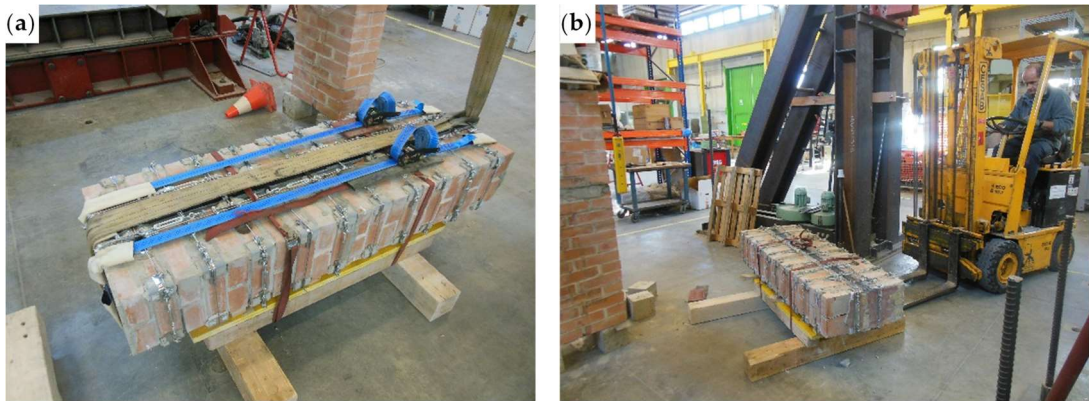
Handling of Specimen W5: (a) overturning of the specimen on the wooden beams, with the wooden "stretcher" placed below and (b) positioning the forklift forks to lift the specimen.
